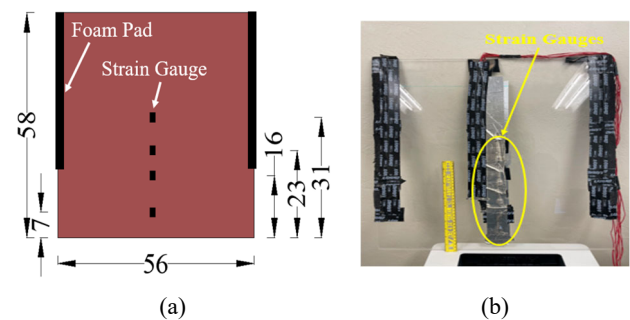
(a) Longitudinal view of sheet pile, (b) Instrumented sheet pile.
